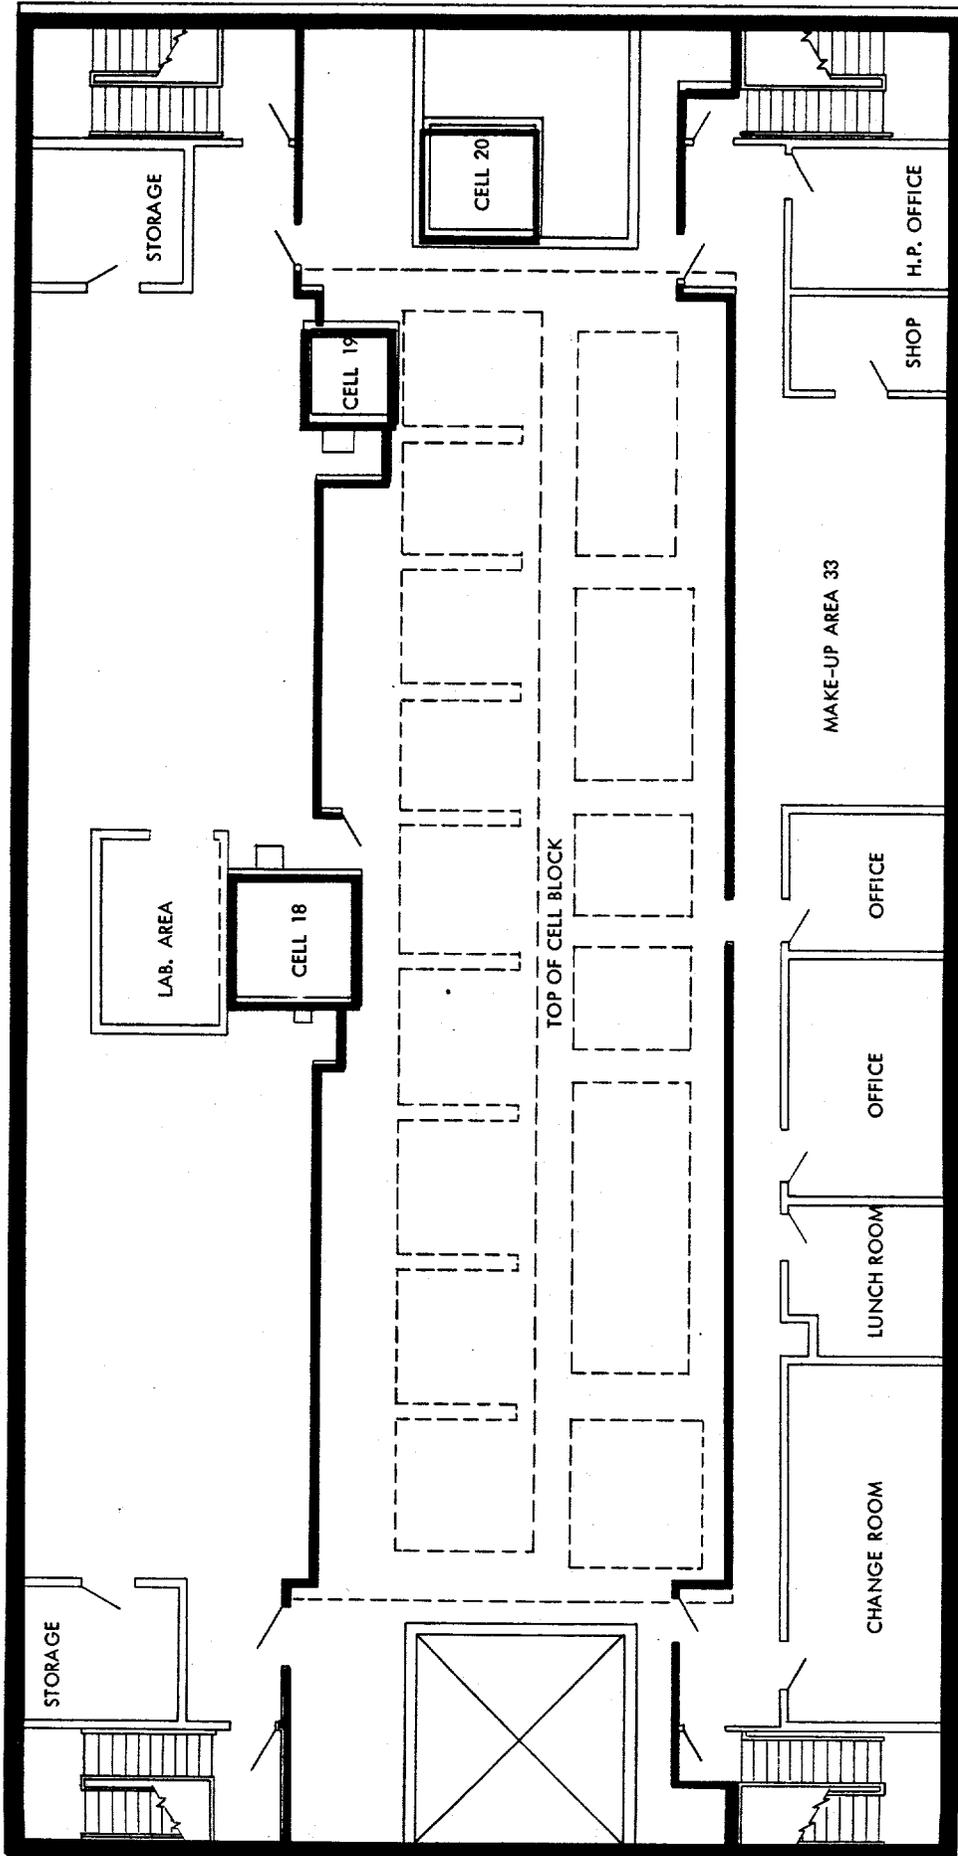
BLDG. 3517 SECOND FLOOR PLAN
